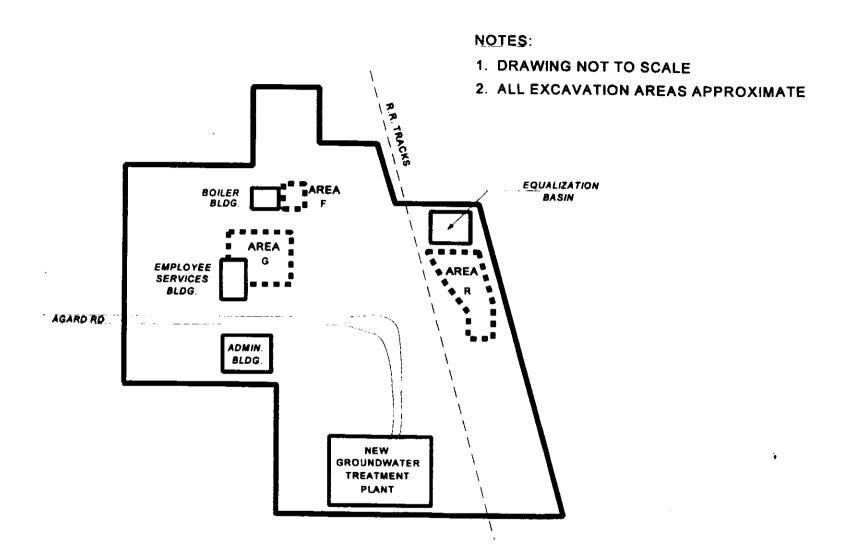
PROPOSED SOIL EXCAVATION AREAS FOR OFF-SITE DISPOSAL
